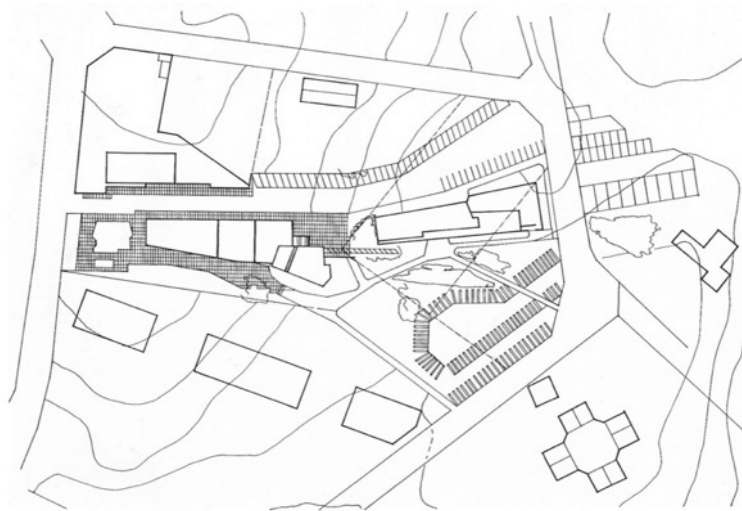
AALTO Alajärvi Town Hall, site plan, church lower right
